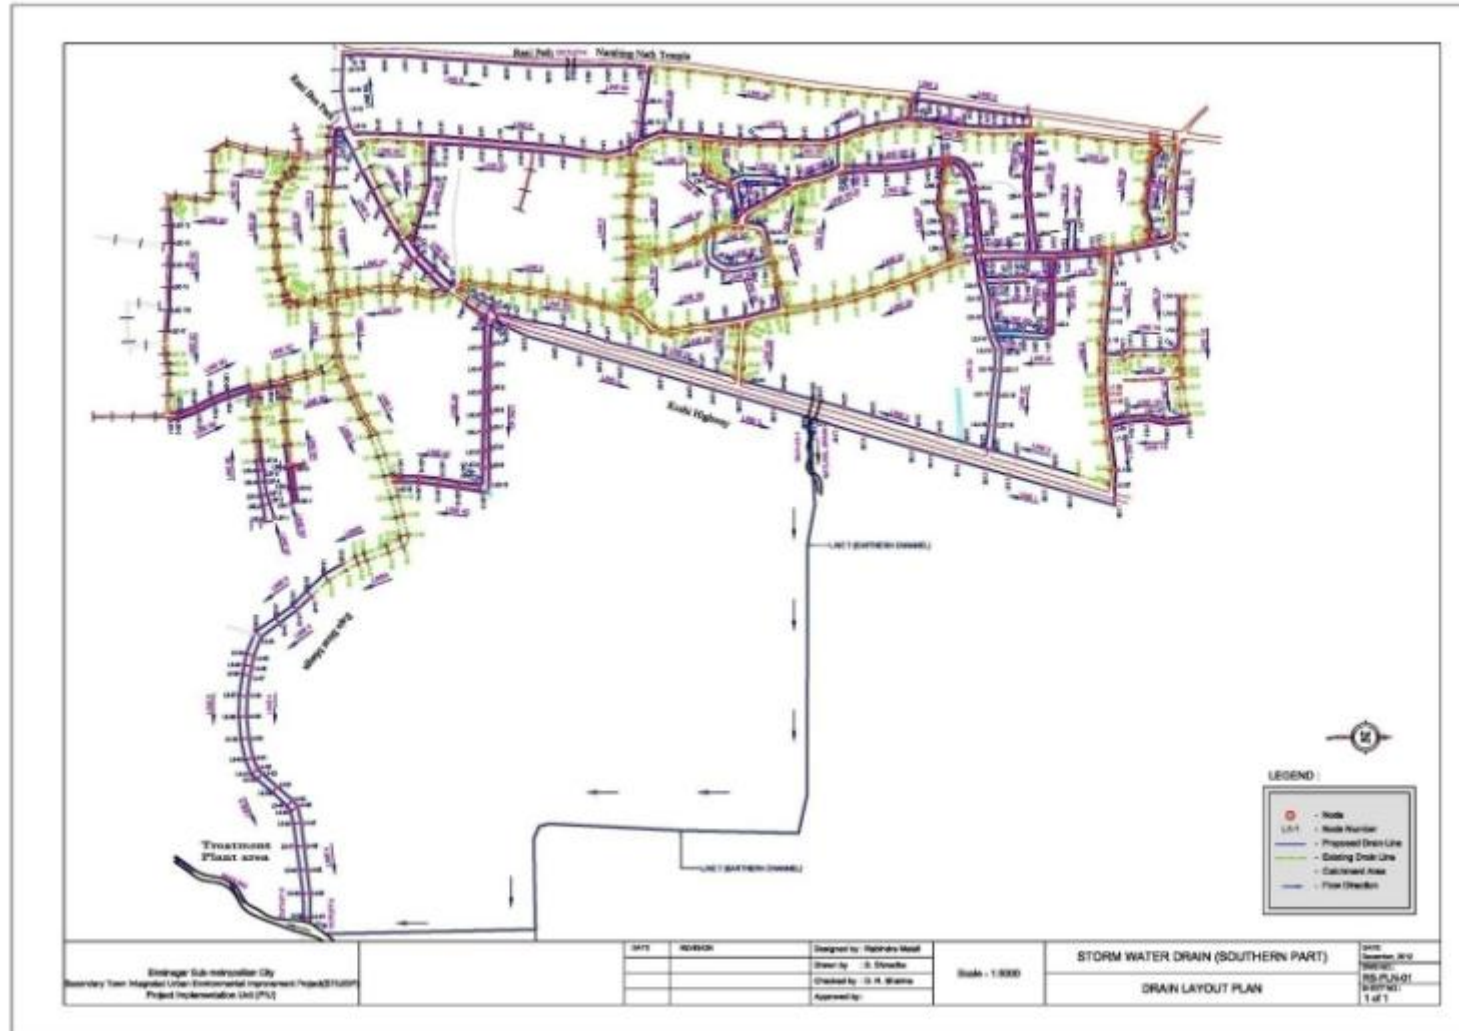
Proposed Storm Water Drains in BSMC (Southern Drainage System)
